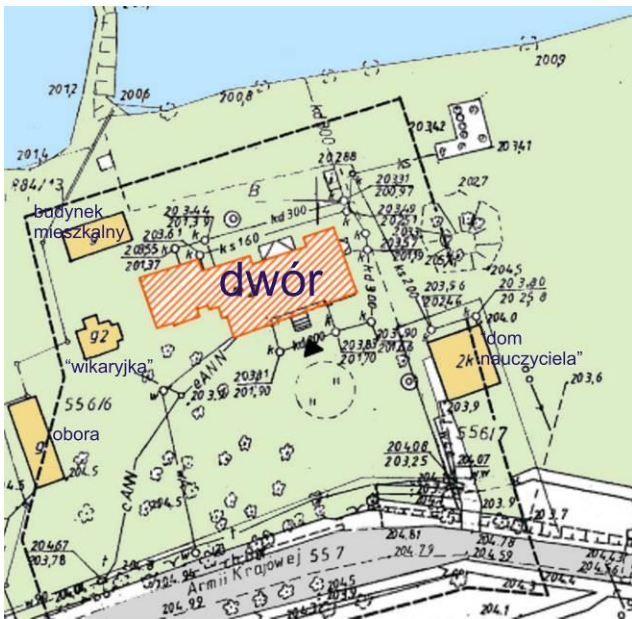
Manor house in Rzuców – site plan: Manor house – orange, Vicarage, Teacher's House, residential building, cowshed – yellow. Source: *Projekt
